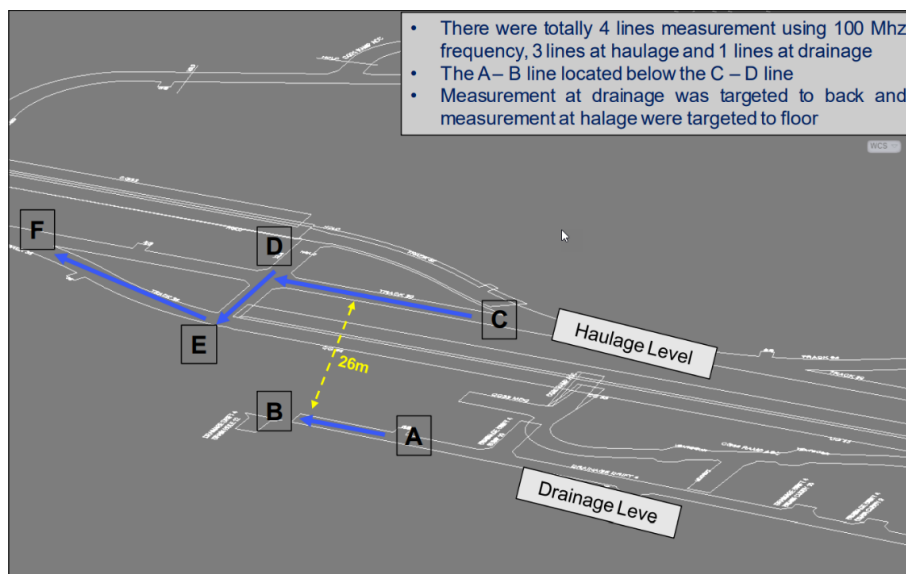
Ground penetrating radar survey line plan from haulage and drainage level to target void and broken ground
